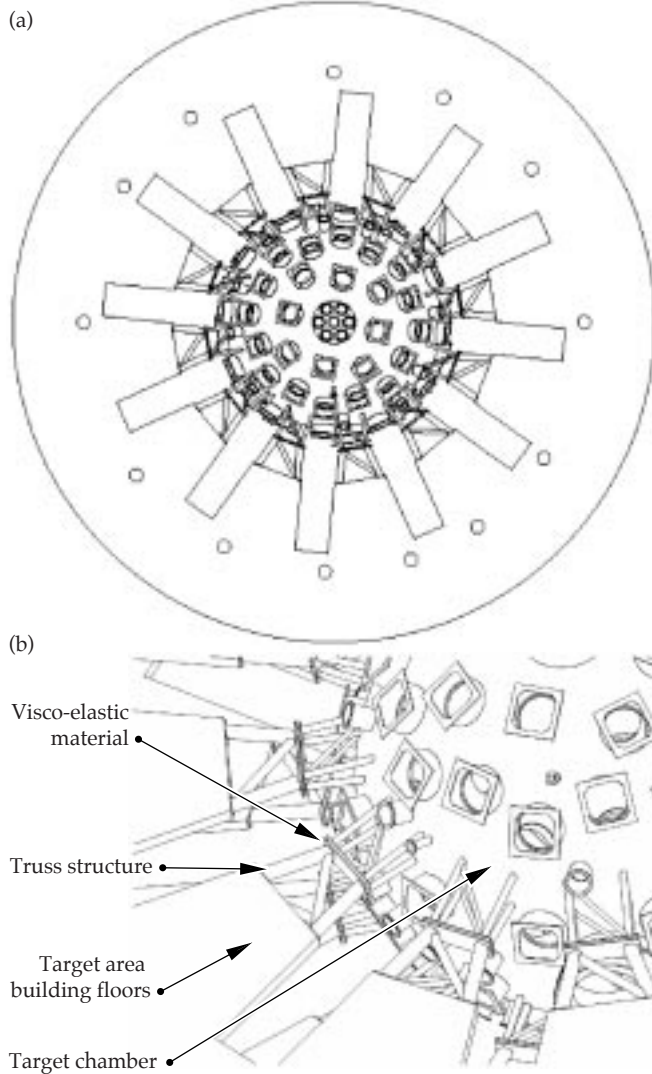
(a) The passive damping structures connect the target area building to the floors of the target chamber, a view from the top of the chamber. (b) Truss structures support a sandwich of steel plates and visco-elastic material. (40-00-1097-2290pb01)
